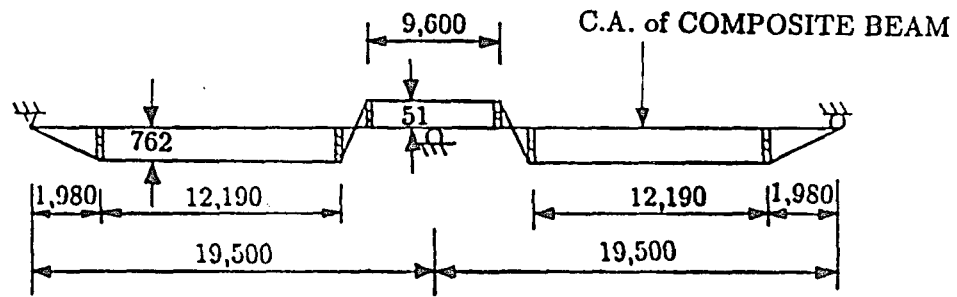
Models of Girders A and B with Draped Continuous Tendons
